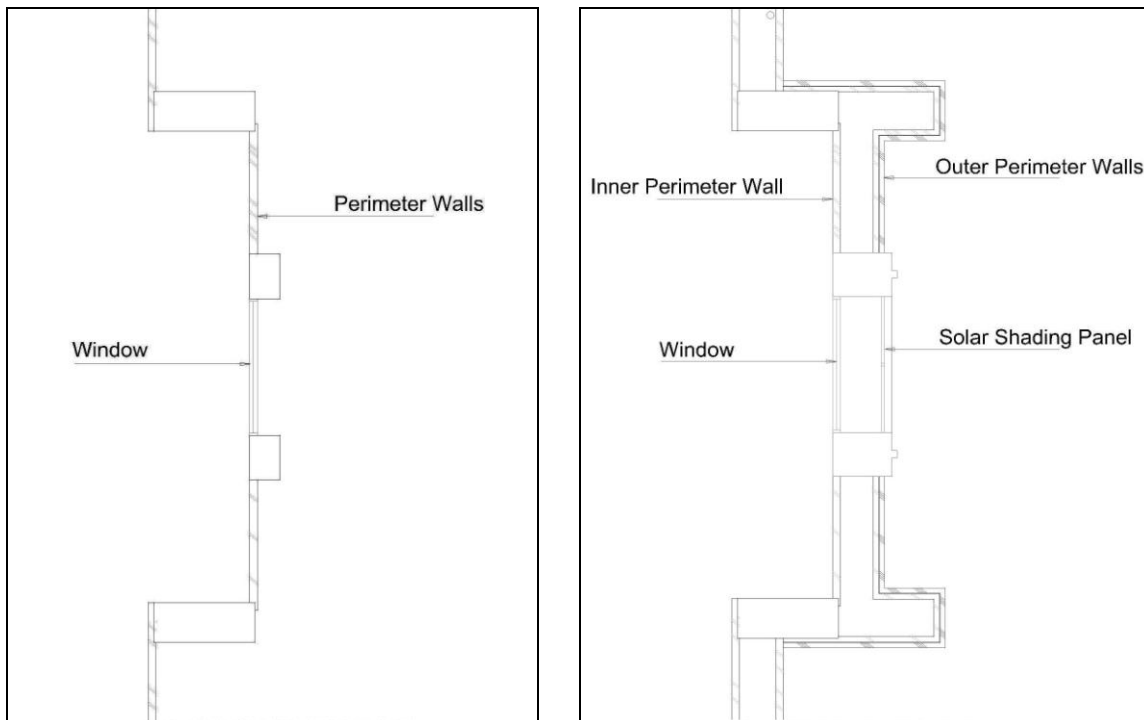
Typical design of perimeter wall for office building in Malaysia (left) and the perimeter wall design in BHEUU (right)
